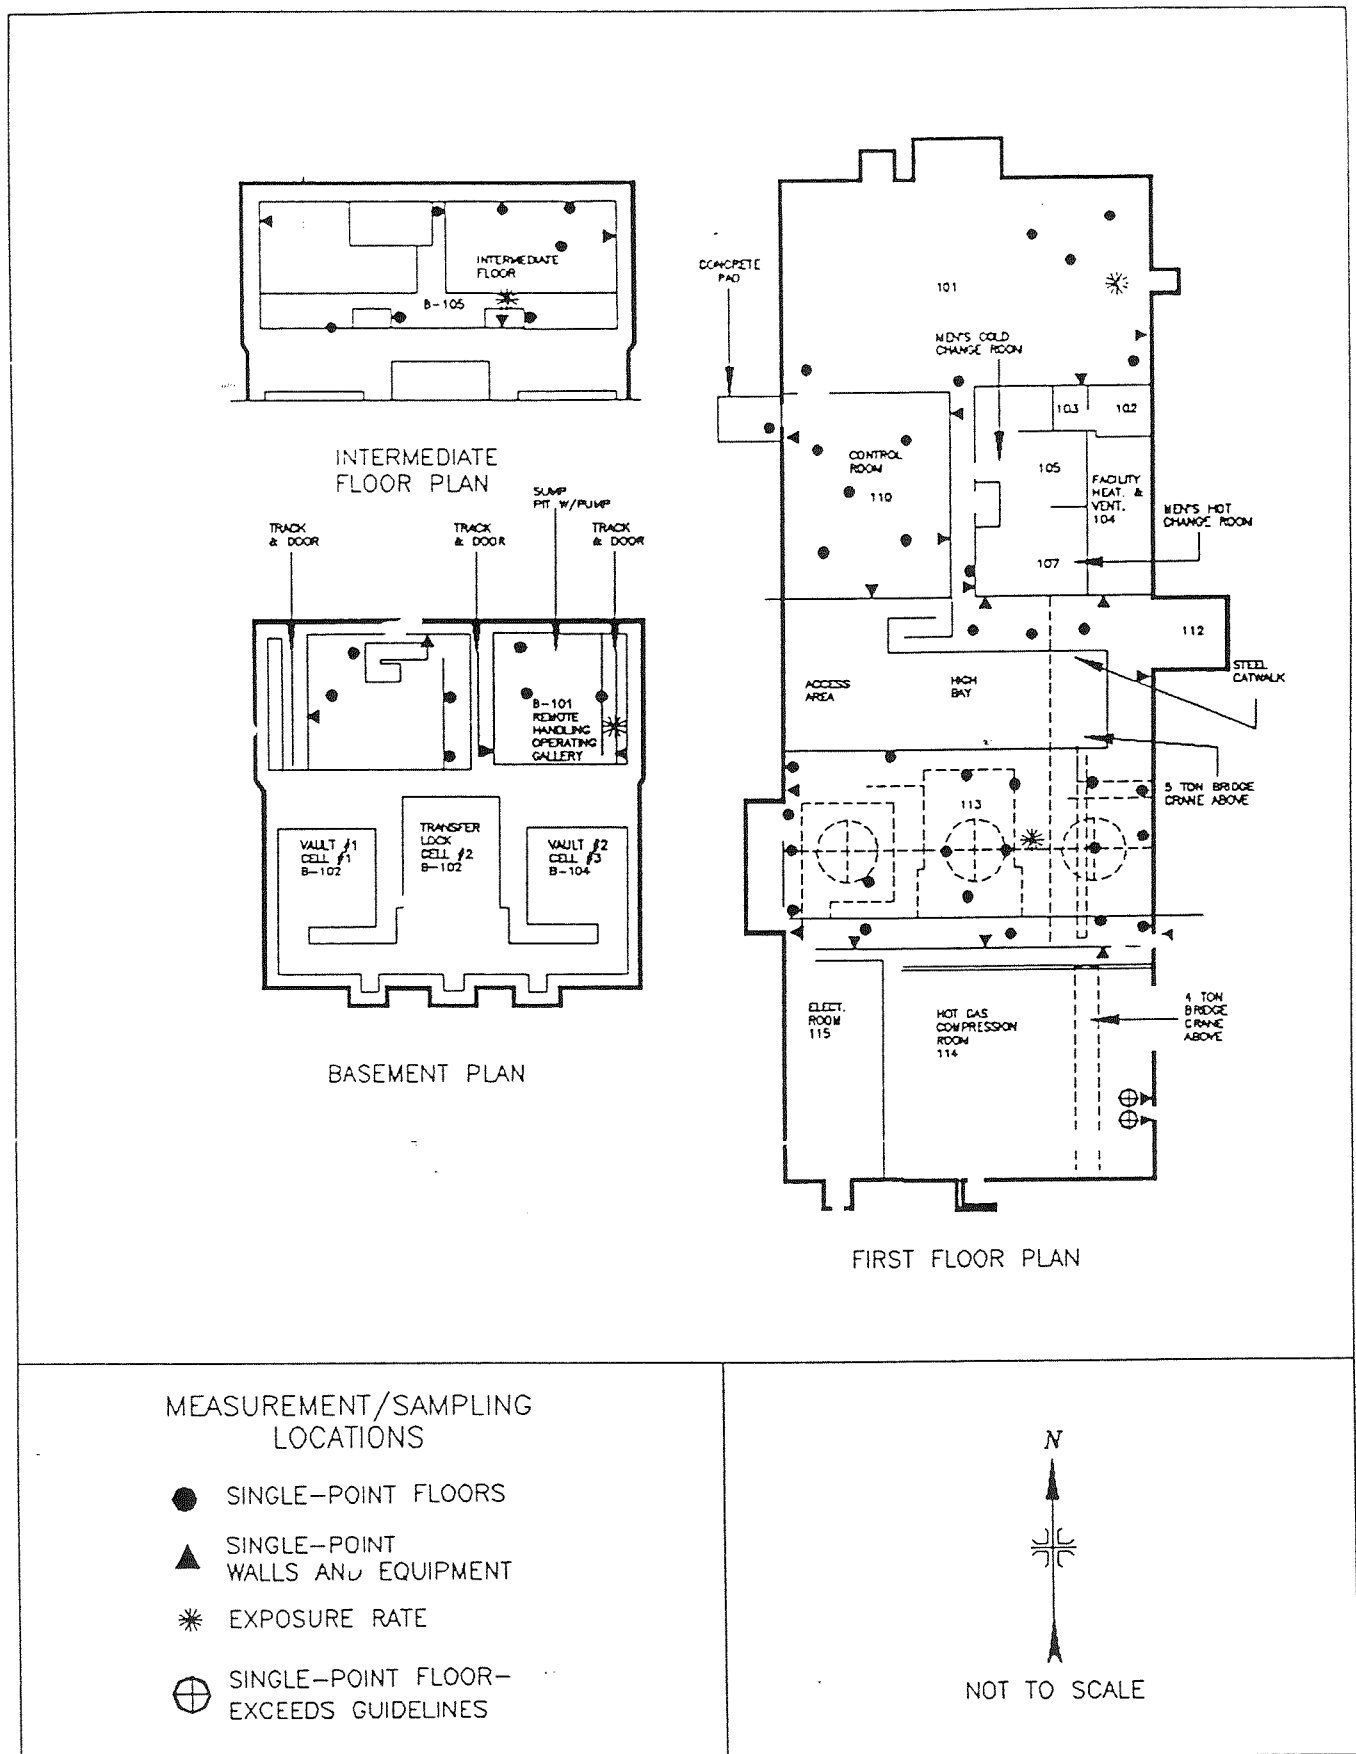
Building T024 – Floor Plan and Measurement and Sampling Locations
